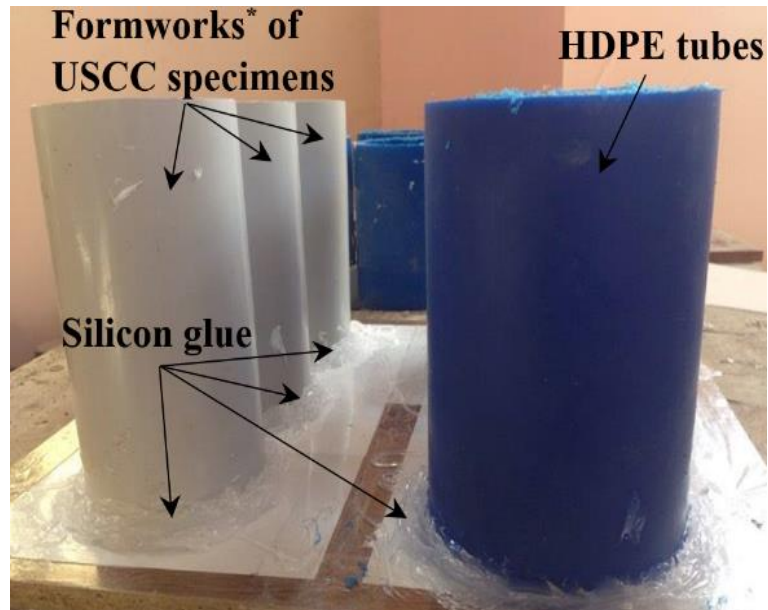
(b) USCC formworks and HDPE tubes before casting*Removed after hardening of concrete
